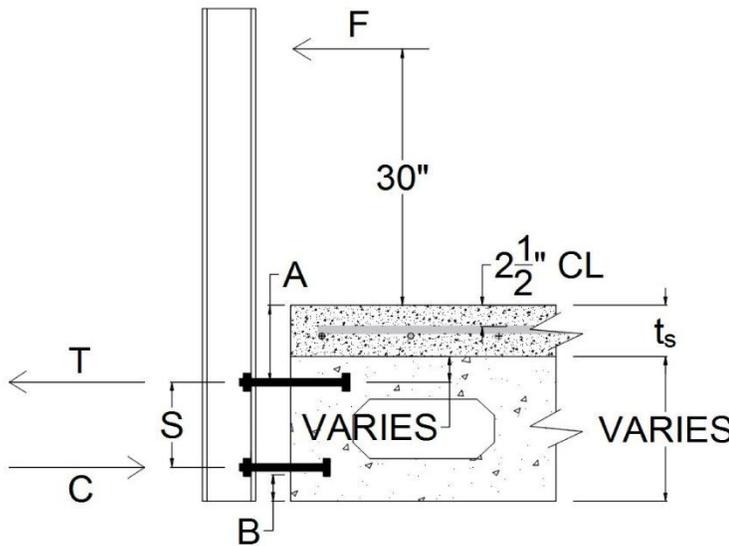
Slab and Box-Beam Girder Configuration, Preliminary Anchor Loadings
